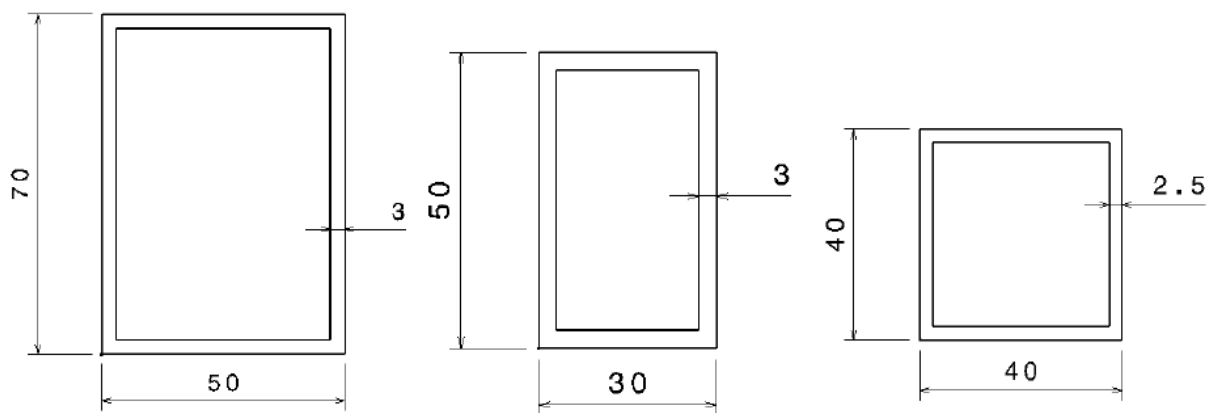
rectangular hollow section profiles employed (dimensions in mm)
